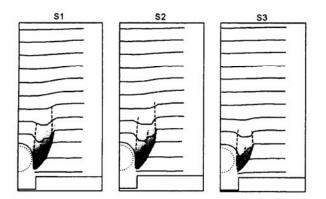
Failure mechanisms of the transverse sections of Model 2 (flexible pipe in dense backfill)
